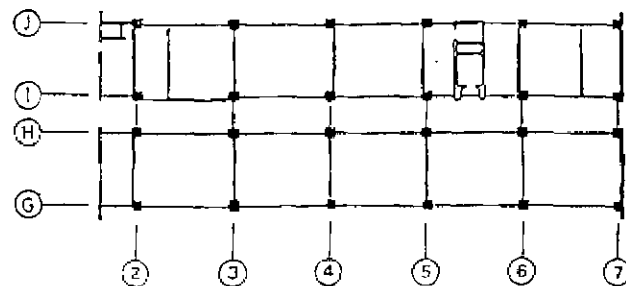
LAYOUT PLAN OF COLUMNS OR WALLS AT THE 3RD FLOOR
